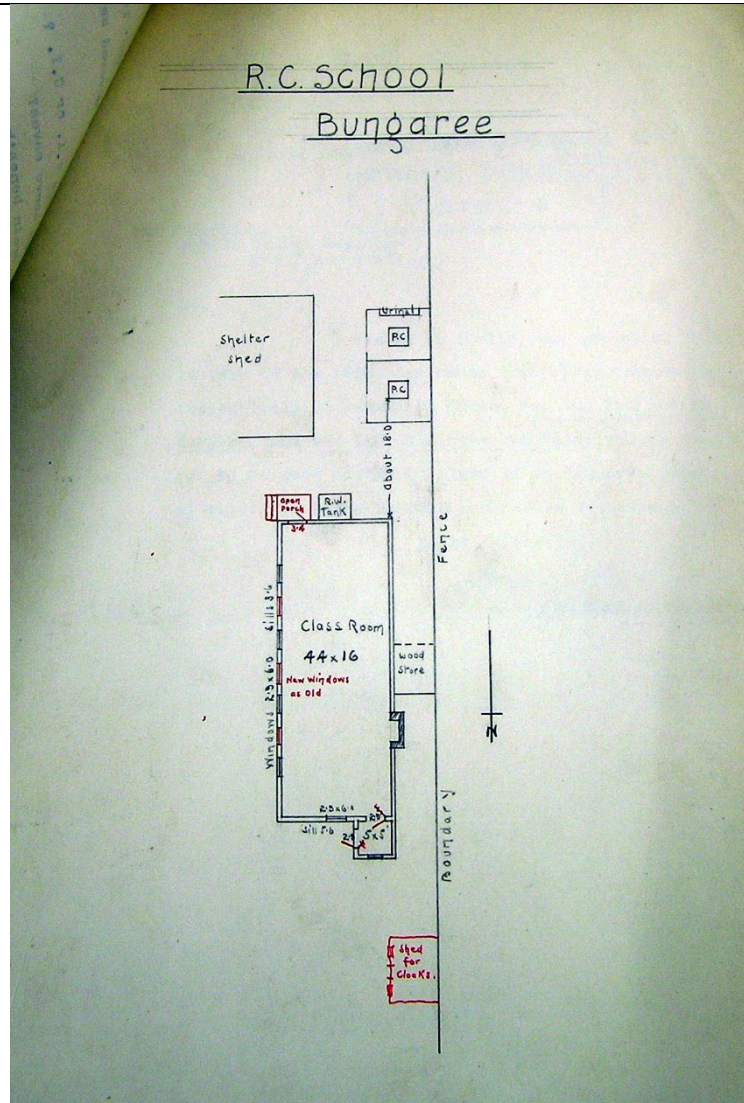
Plan of the School, Bungaree, n.d. [c.1905].
